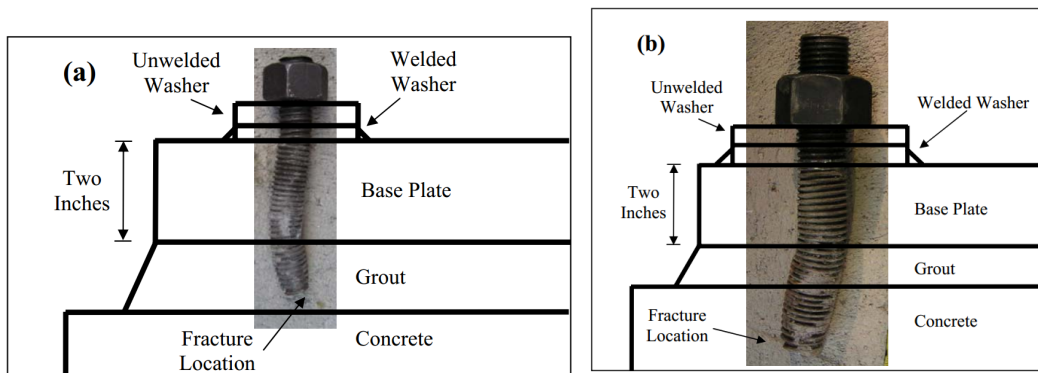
To-scale illustration of fractured (a) 19 mm [0.75 in.] diameter anchor rod and (b) 31.8 mm [1.25 in.] rod relative to base plate, grout and concrete
